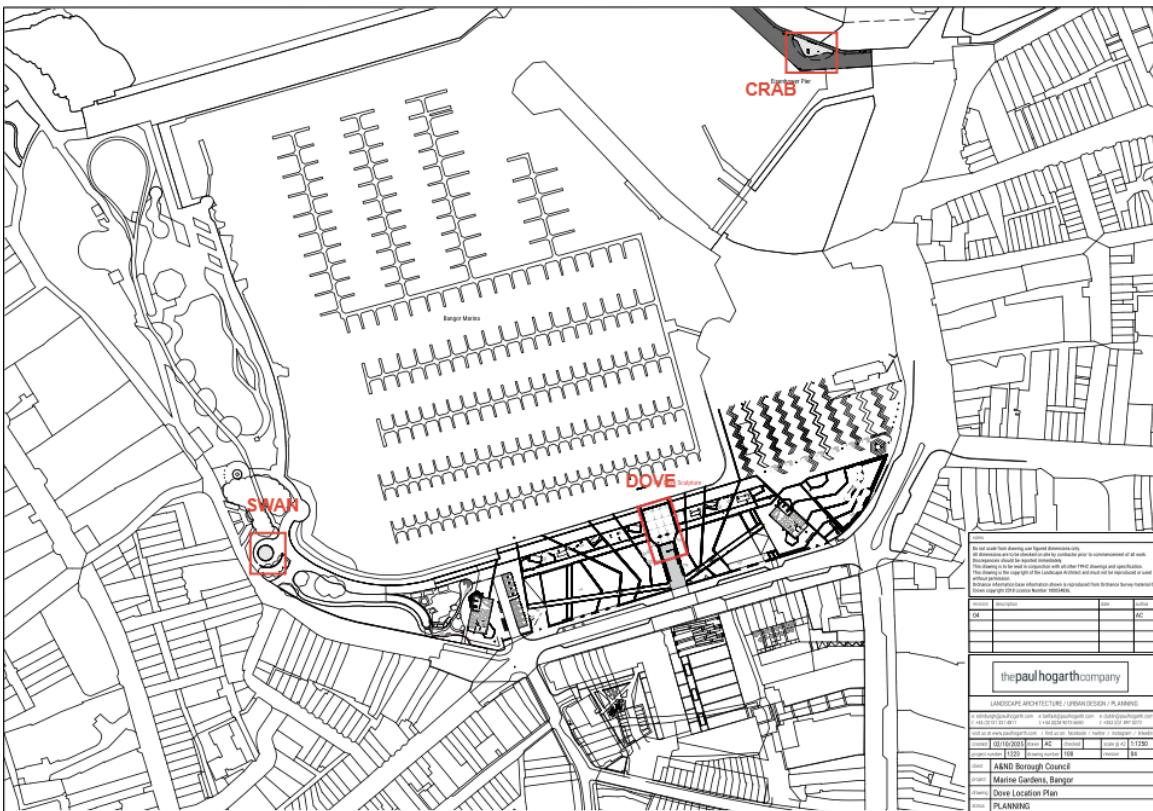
Site Layout showing approximate locations of each proposed sculpture
